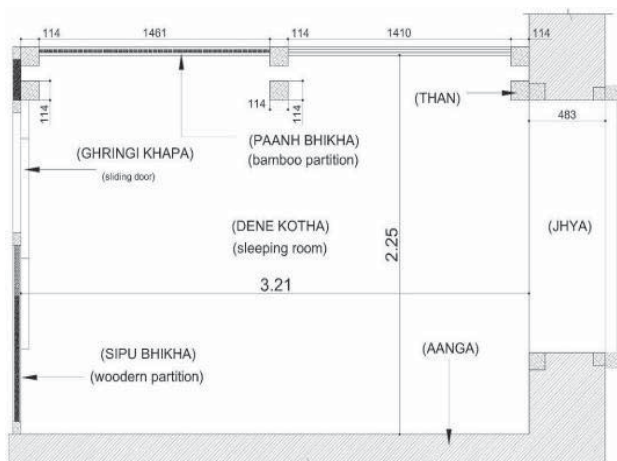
Plan showing different bhikha (Partition wall) (Author, 2012)
